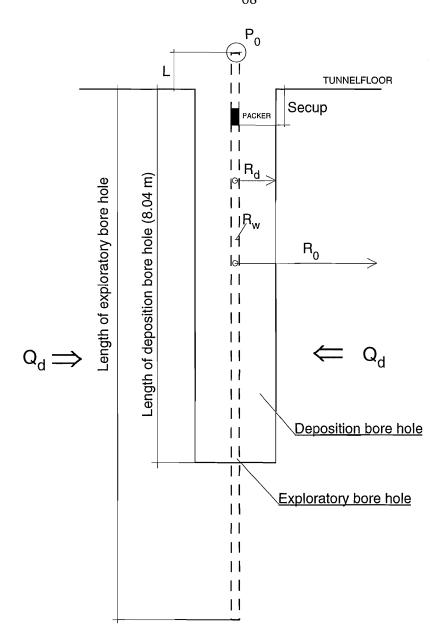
Schematic layout of deposition bore hole and exploratory bore hole
